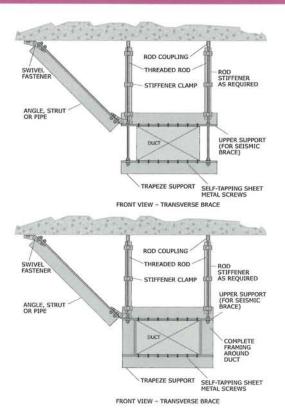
Rectangular duct with vertical rods and braced with steel shapes (transverse).
